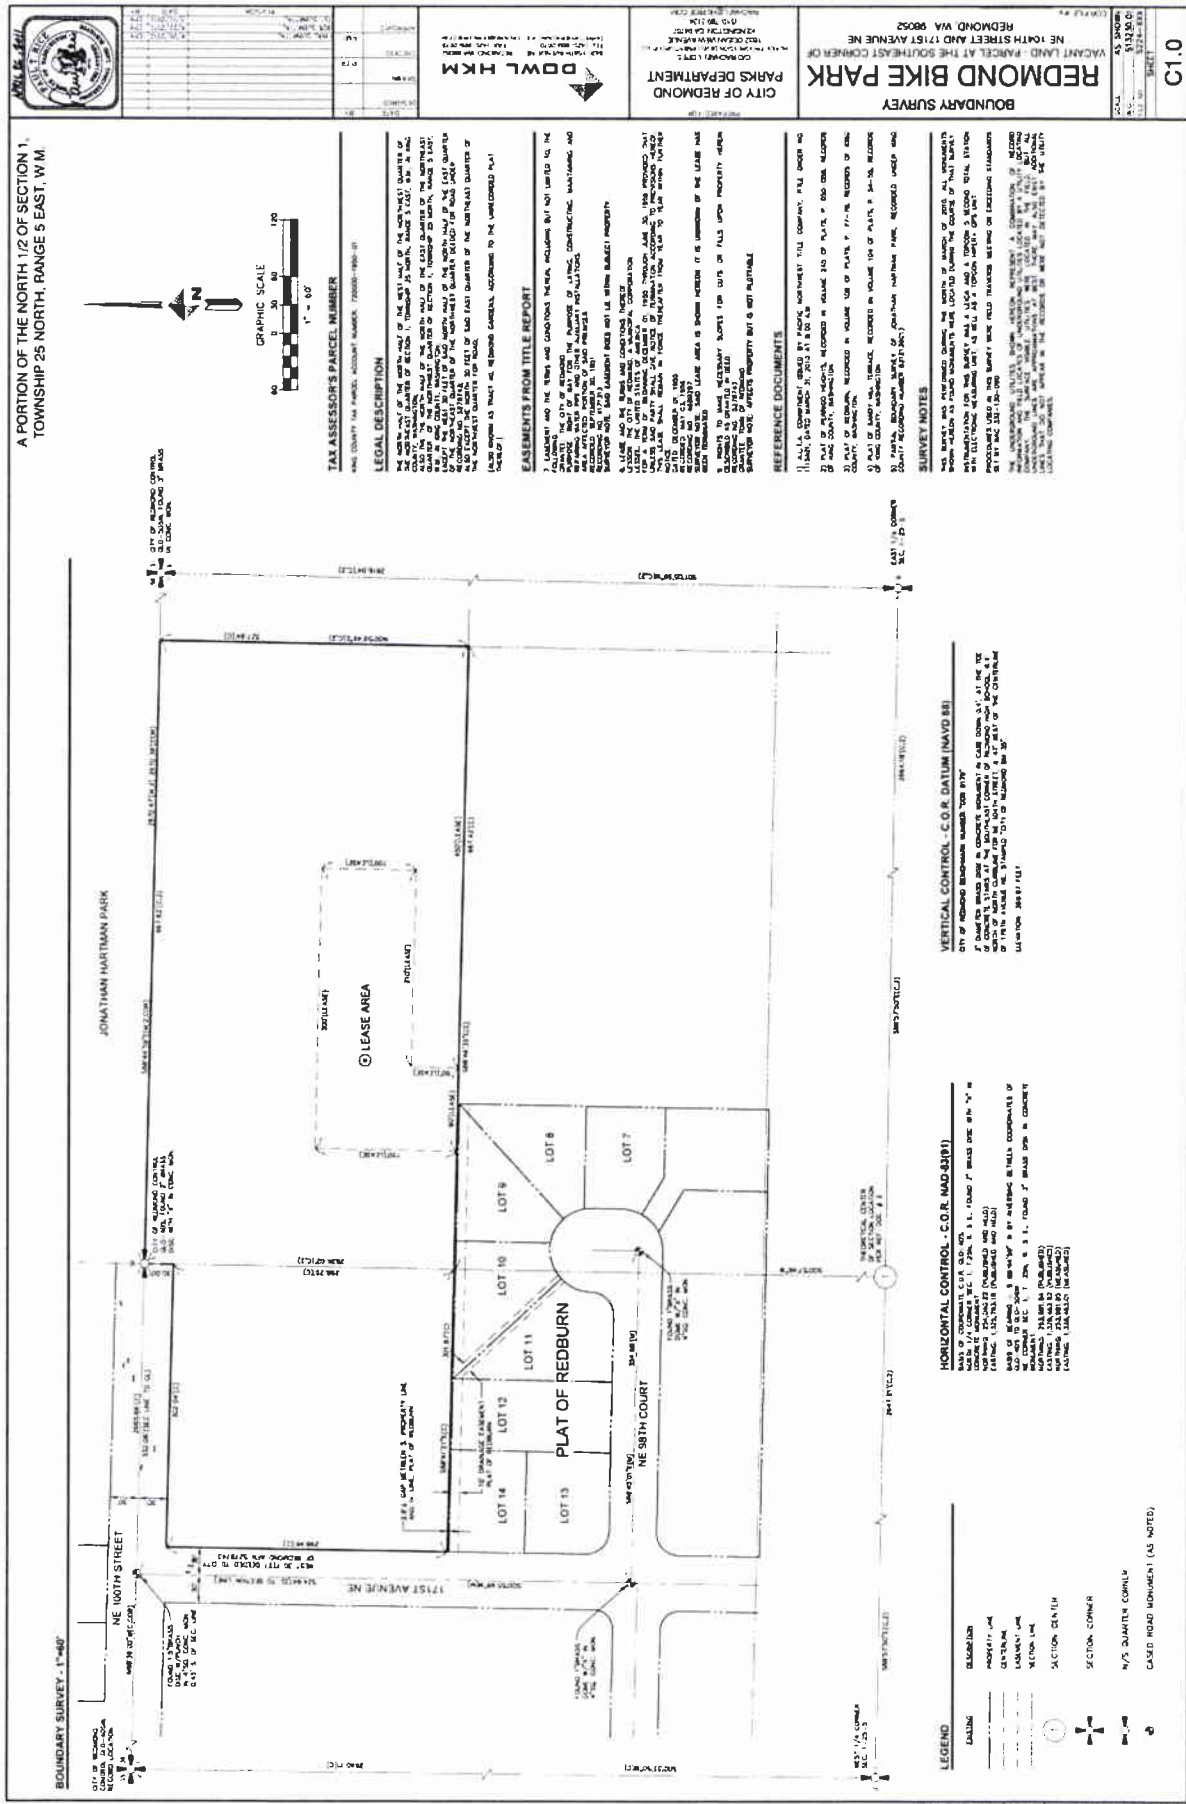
Topographic Survey & Site Plan of Redmond Bike Park
